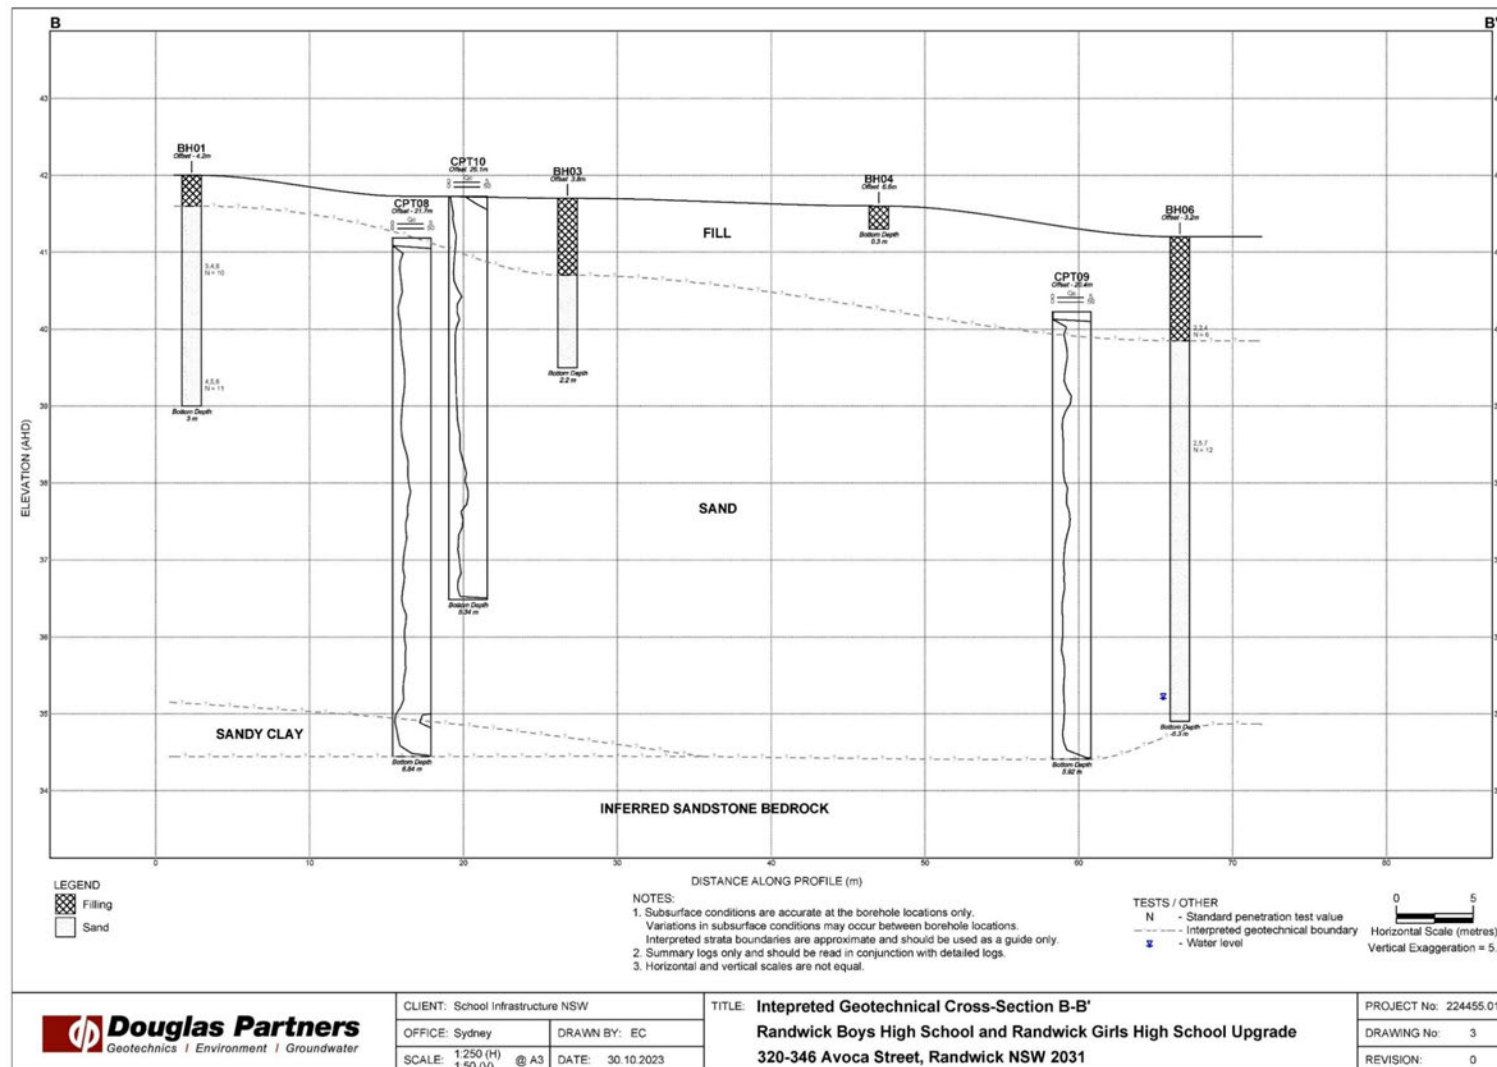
Geotech cross section N-S, (Douglass Partners 2023)
